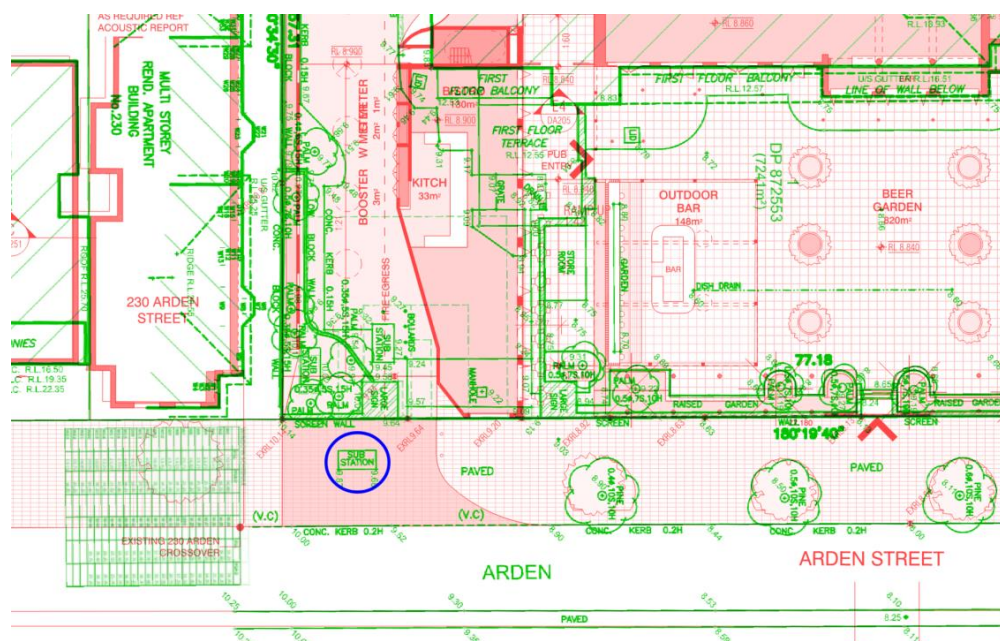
Overlay of the existing survey (in green) and approved ground floor plan (in red) as per DA/437/2021 (Source: Fender Katsalidis)
